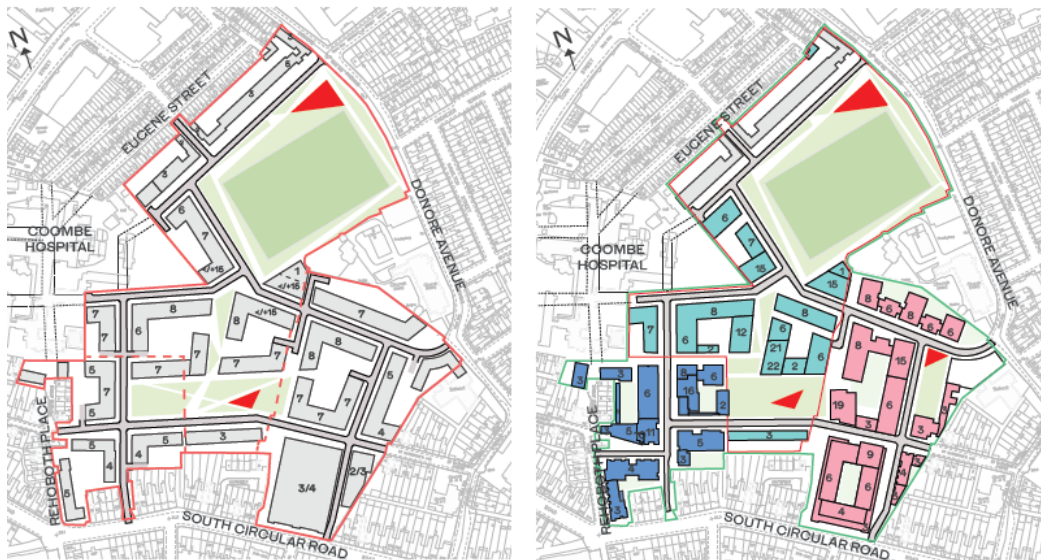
FRAMEWORK PLAN & MASTERPLAN HEIGHT STRATEGY
